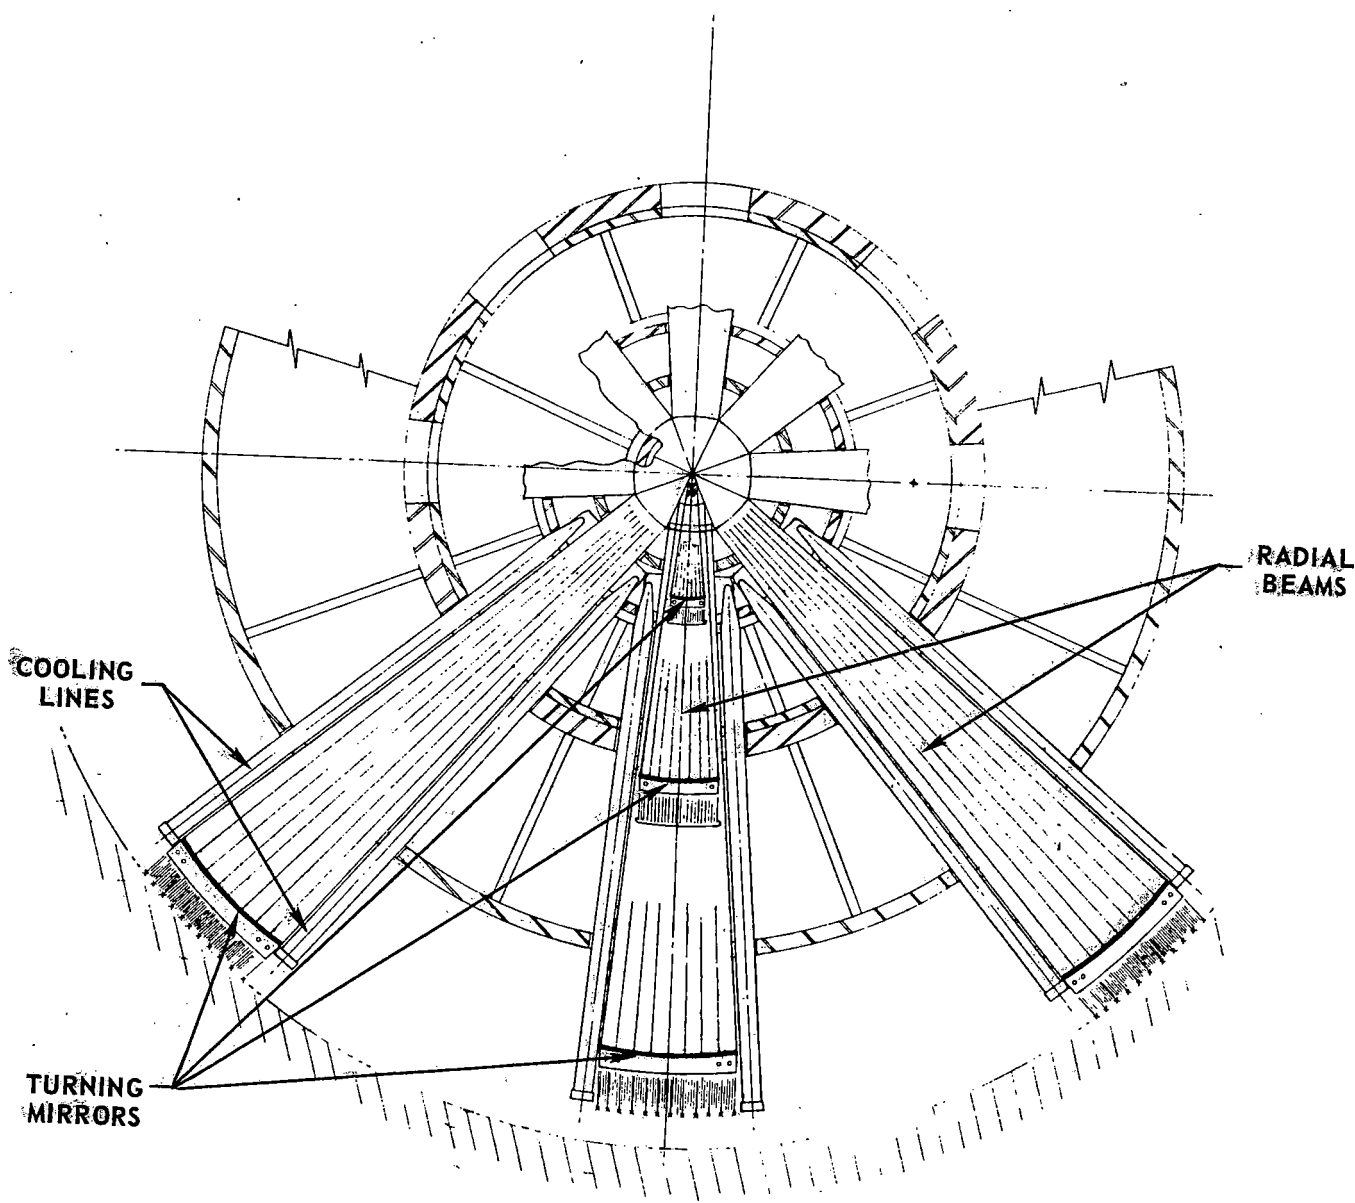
SECTIONAL END VIEW OF BORING MACHINE HEAD
